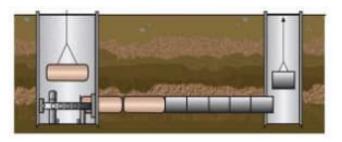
Guided Auger Boring Stage 3: Installing Product pipe
